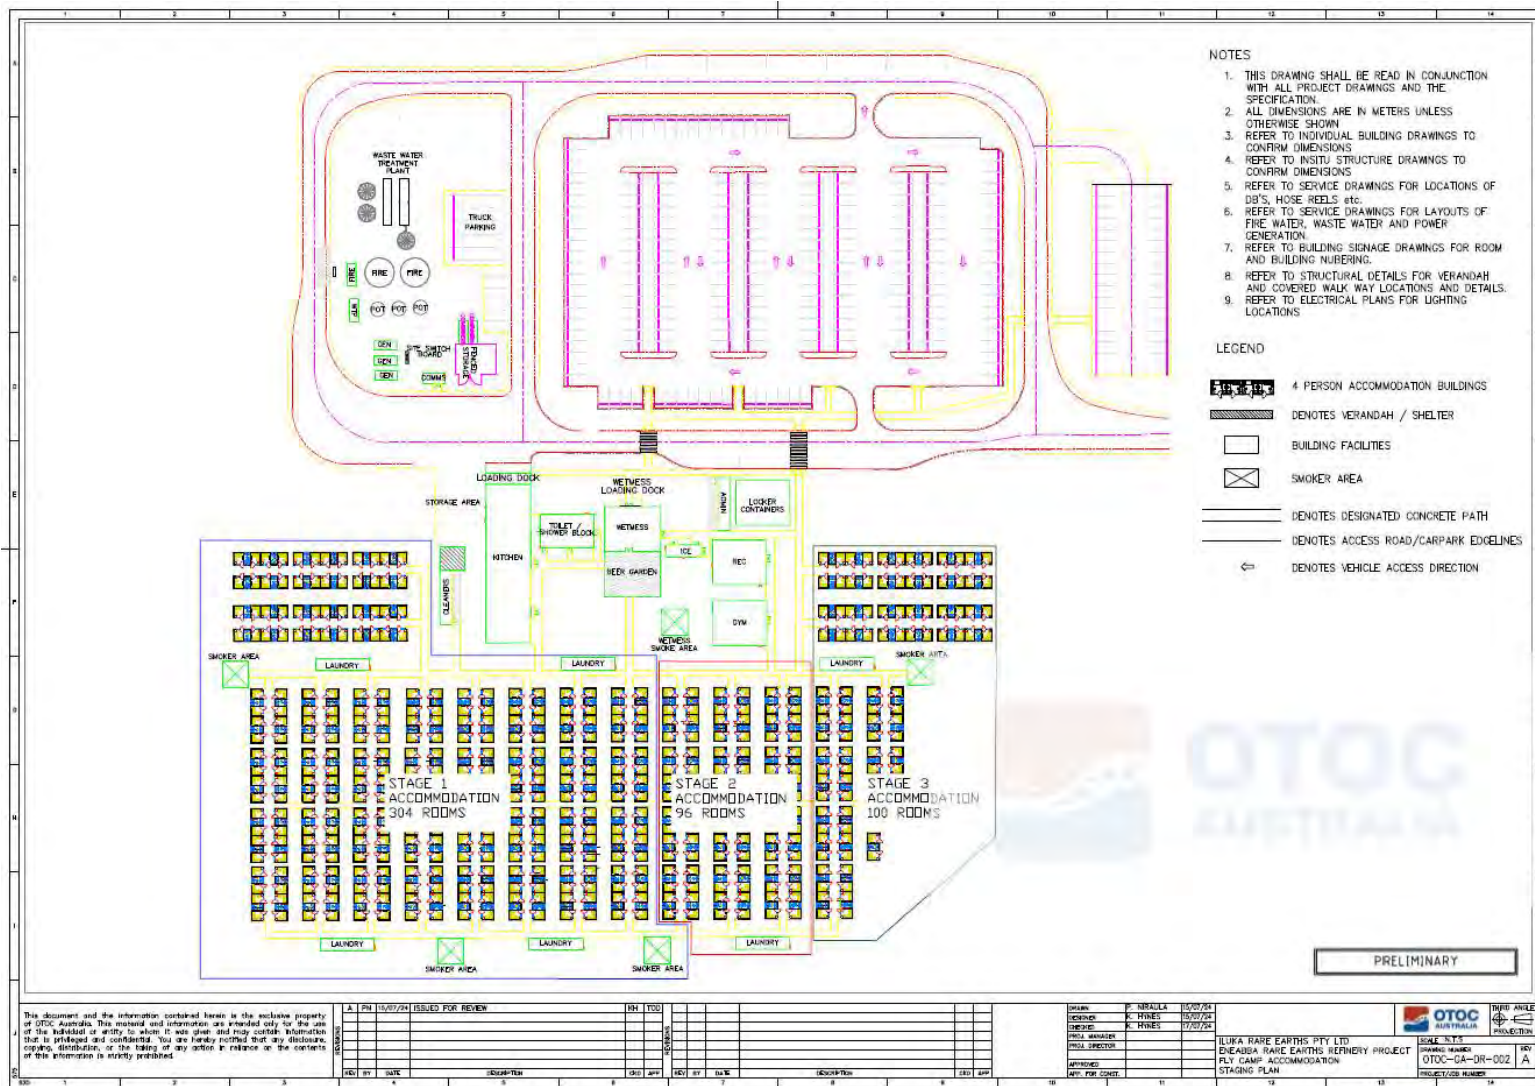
Eneabba Temporary Construction Camp General Arrangement
